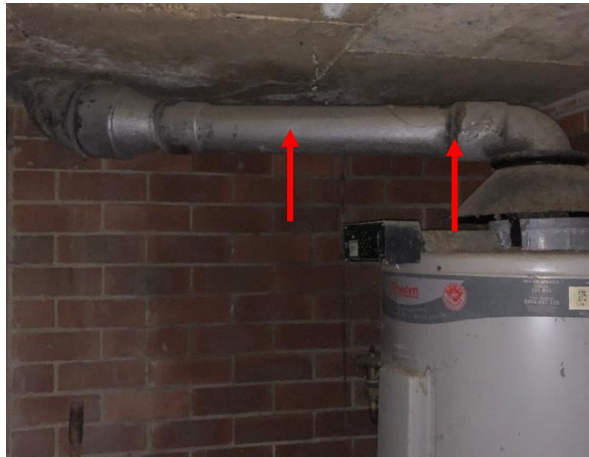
Building E - Asbestos ventilation pipe with asbestos mastic to collar joints extending from hot water unit in sub floor areas to roof lining. One unit observed to each of ER9001 and ER9002
